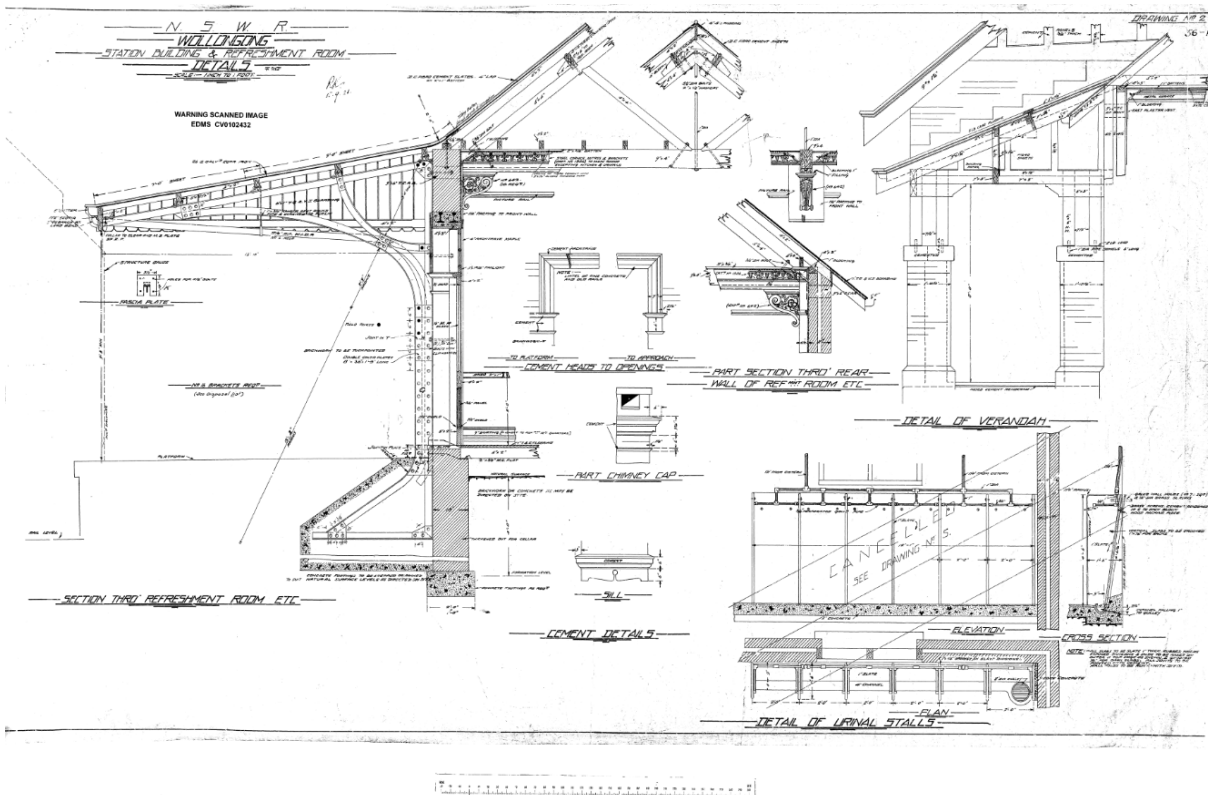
Details of elements of second station building and refreshment room, c.1921
